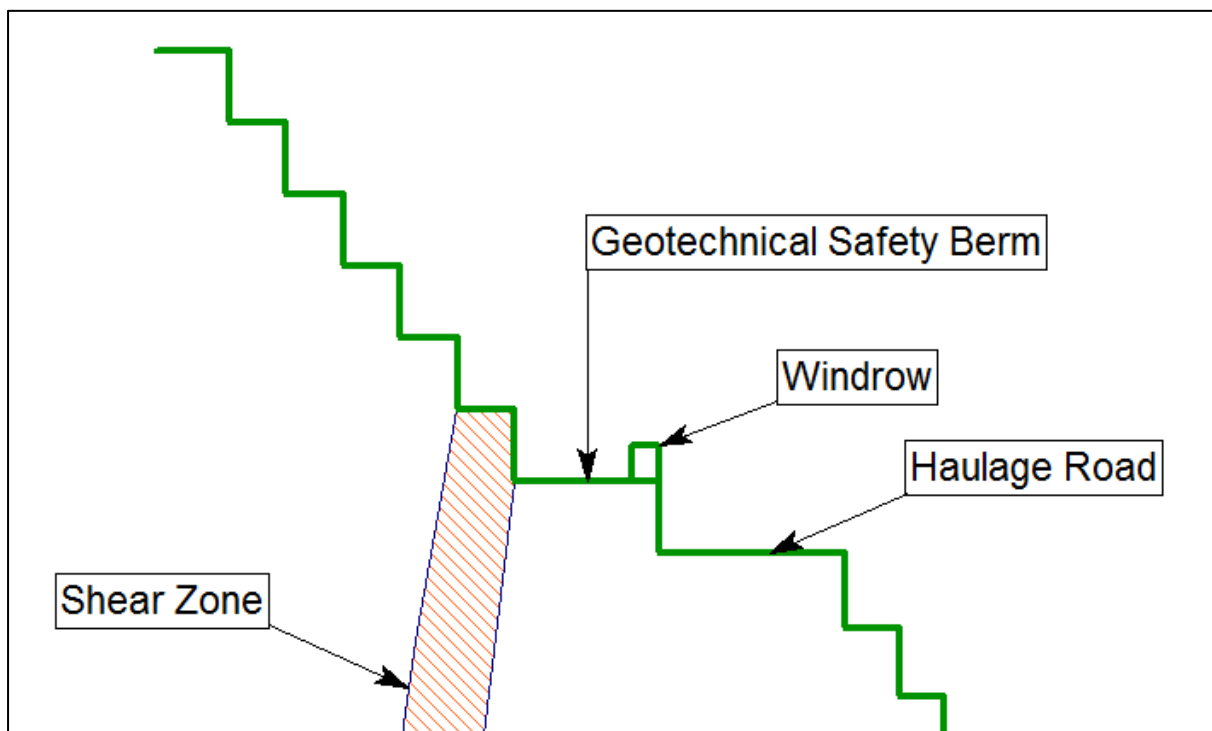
Cross-section view of the major South Eastern shear zone, geotechnical safety berm and haulage ramp
